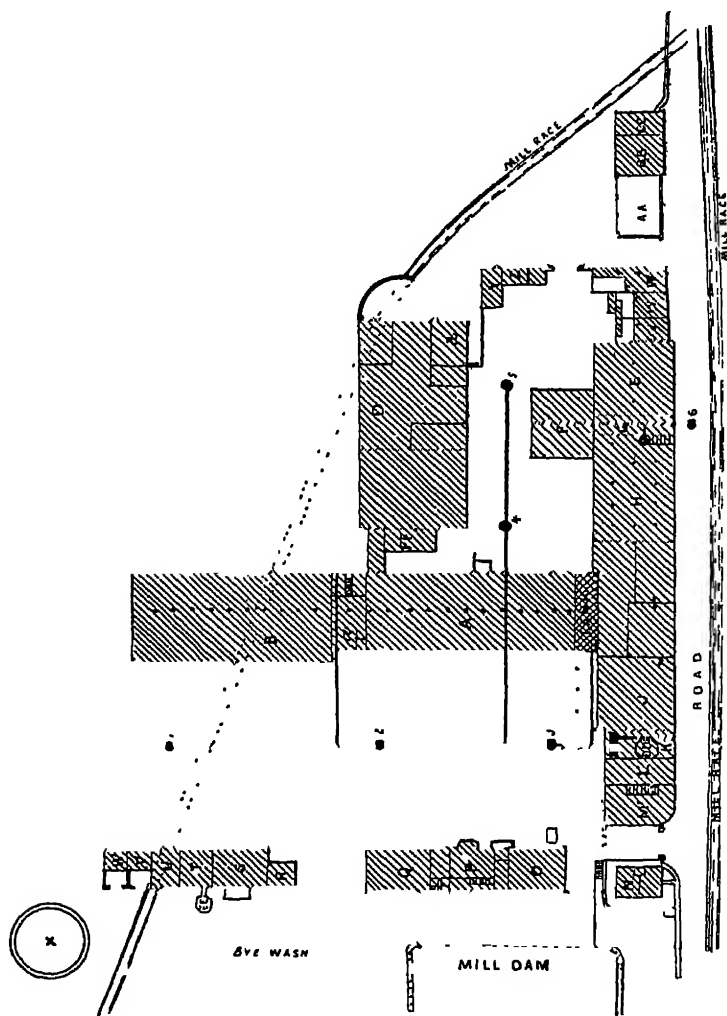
Complete System of Fire Prevention for Industrial Establishments, by Merryweather & Sons, Ltd.
